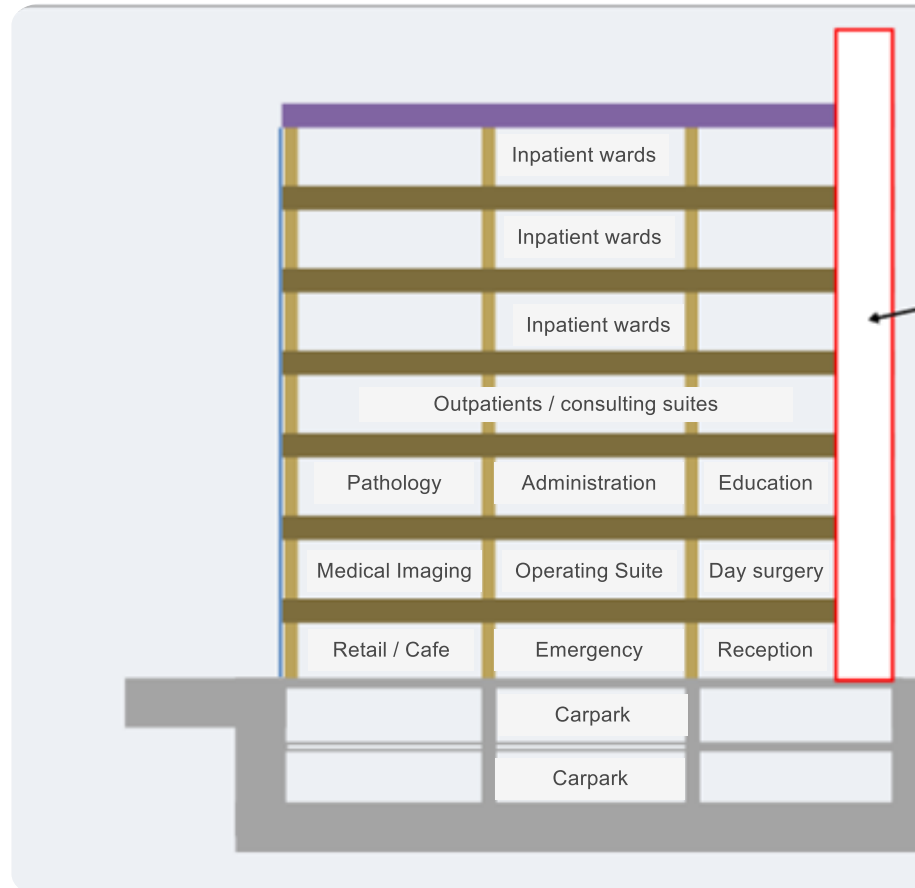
Typical Schematic Section through mid-rise hospital building.
